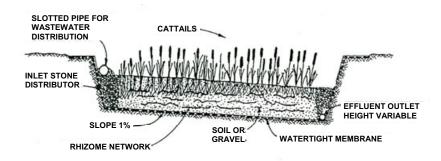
Typical cross-section of SF constructed wetlands (U.S. EPA 1988)
